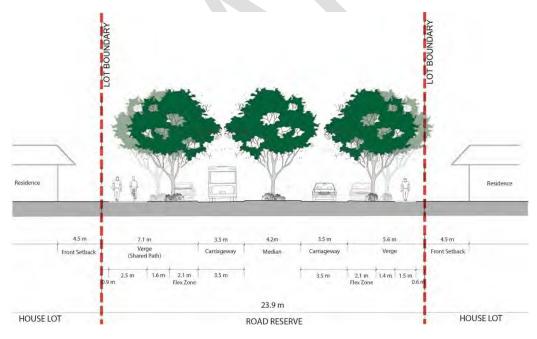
Collector Road Cross Section – Median (Flex Zone)
